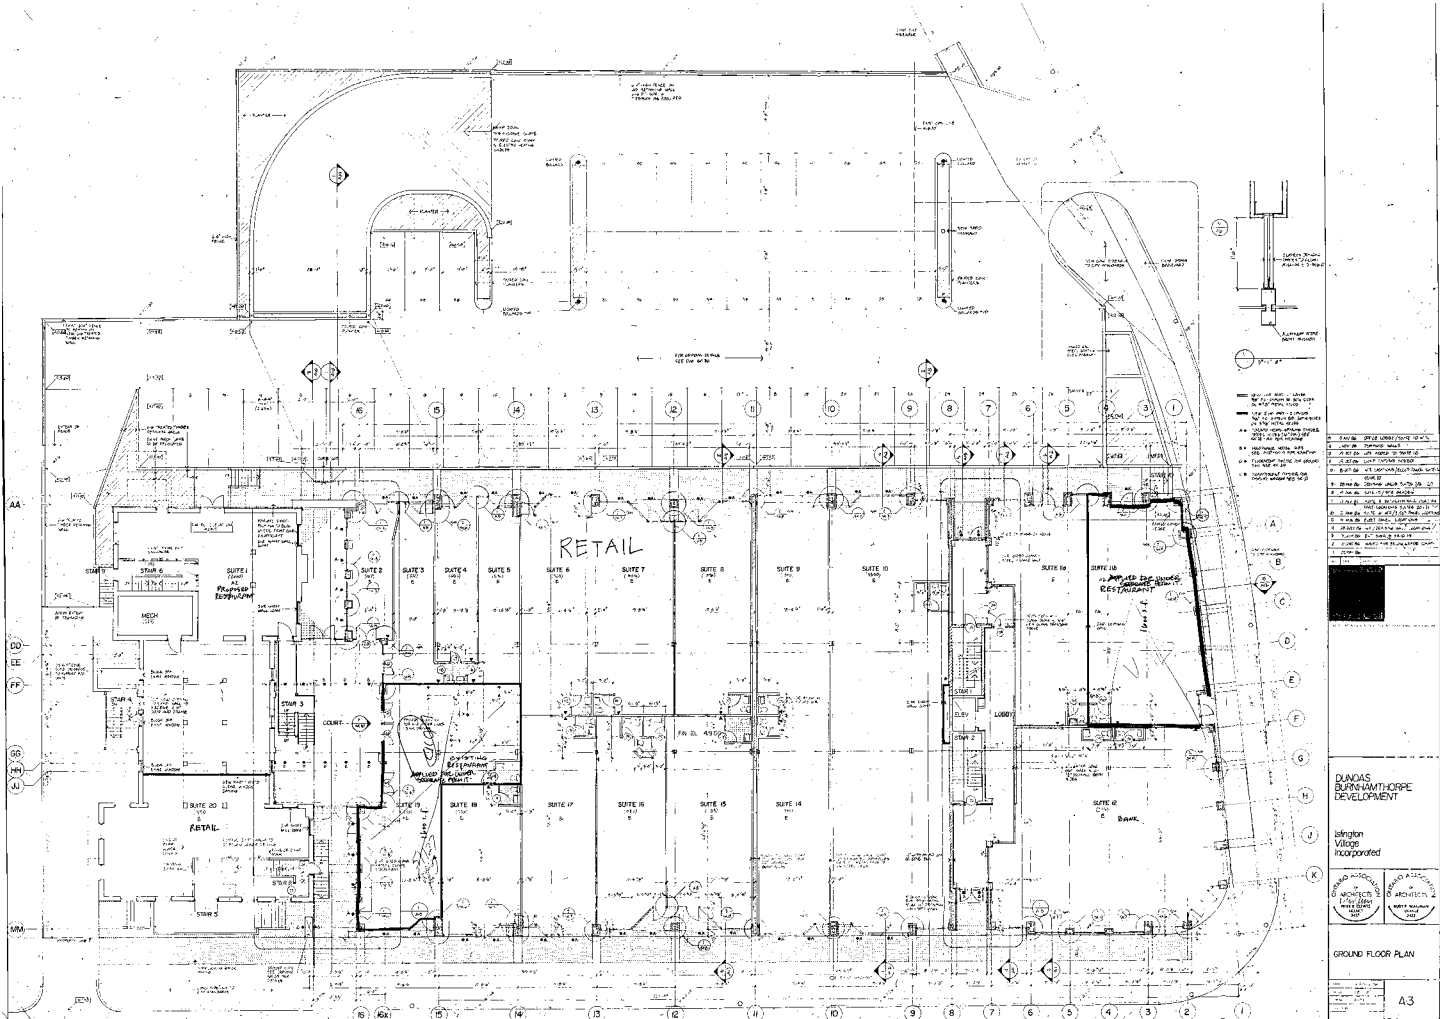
Ground Floor Plan of the Dundas Burnhamthorpe Development, 1986 Building Permit Records
